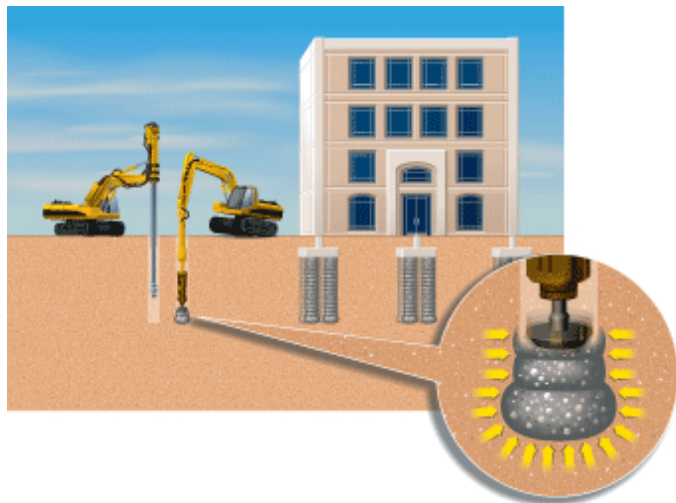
<sup>3</sup> – Geopier Foundation System
